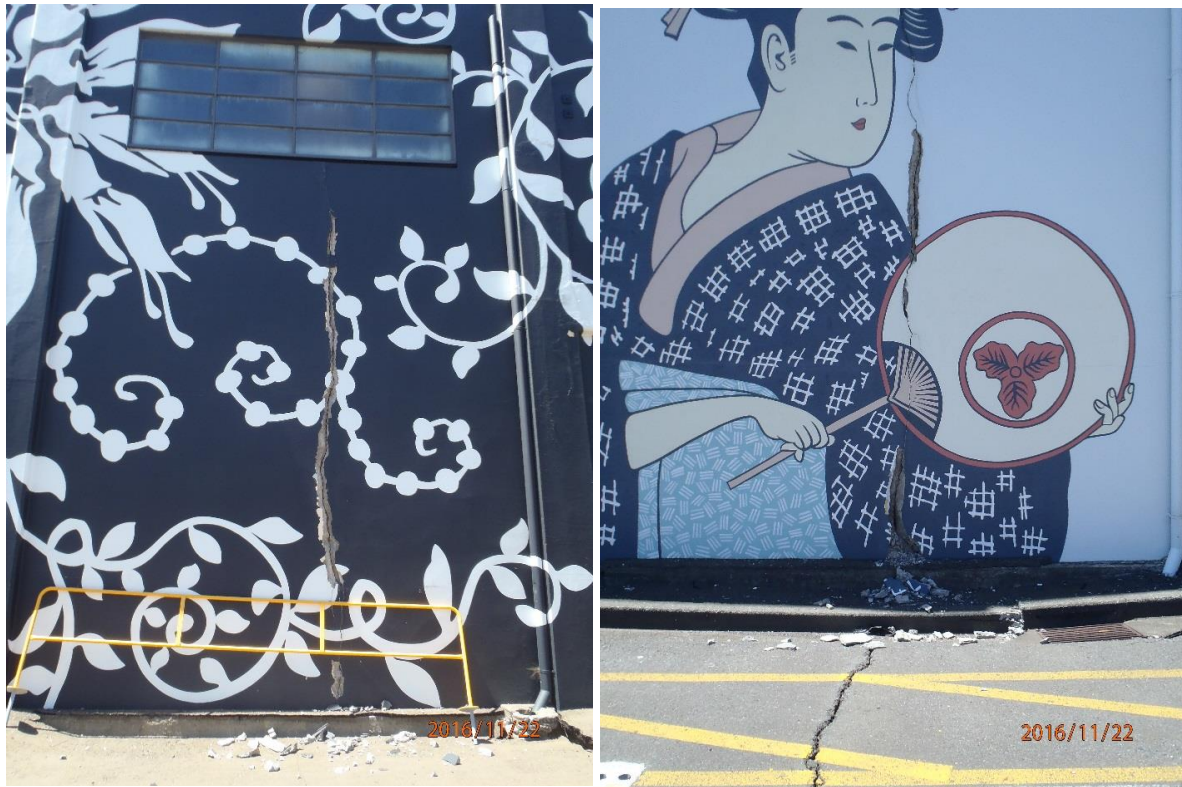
Vertical cracks along exterior west wall of S51 located at approximately 25 meters (left photo), and 60 meters (right photo) north of the southwest building corner. (Left: S41.272224°, E174.787391°, taken at 1316 hrs on 22NOV16. Right: S41.271906°, E174.787307°, taken at 1312 hrs on 22NOV16)
